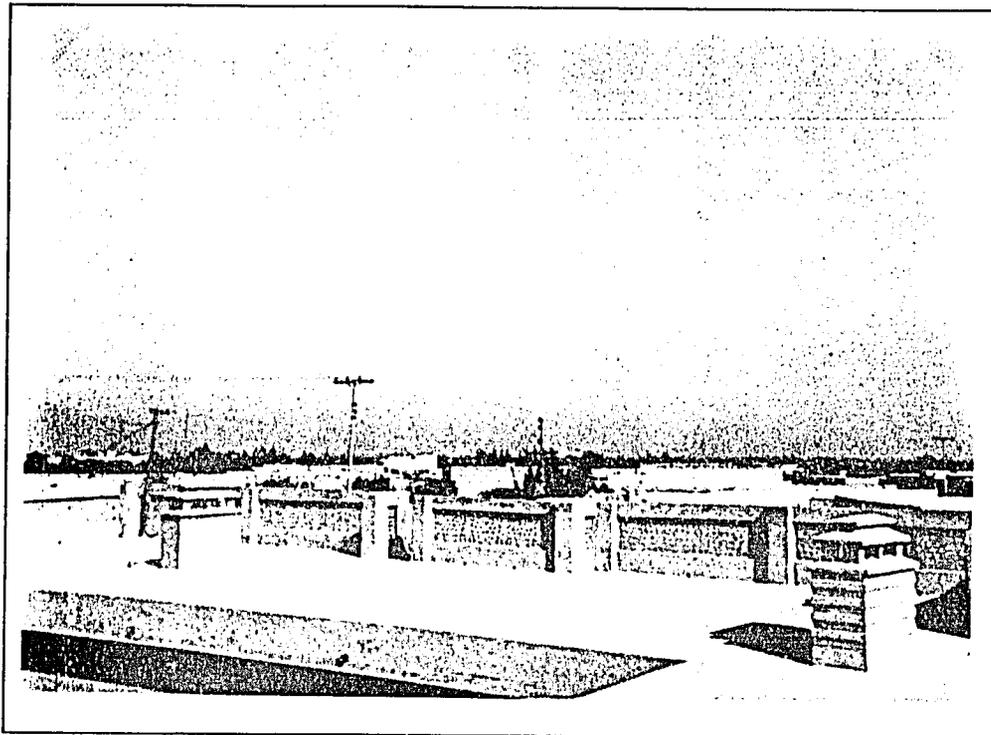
Quetta HF Base Station Site. View facing east from existing building.
